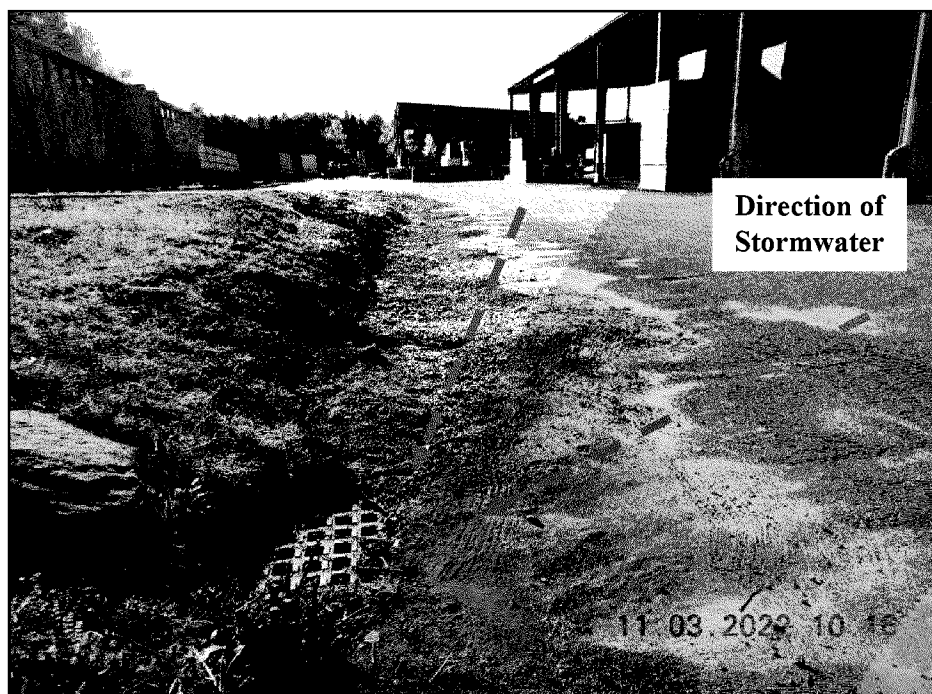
View, facing east, of the ditch along the south perimeter. Stormwater flows east to the southeast basin.
